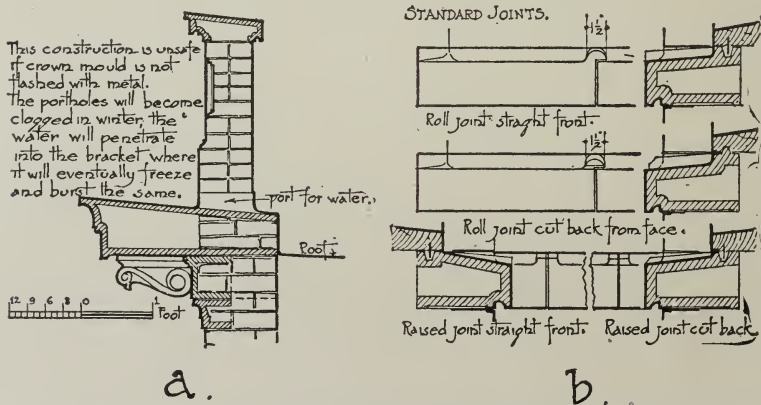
a. Cornice Coping, Poor Construction. b. Standard Terra-cotta Joints.
